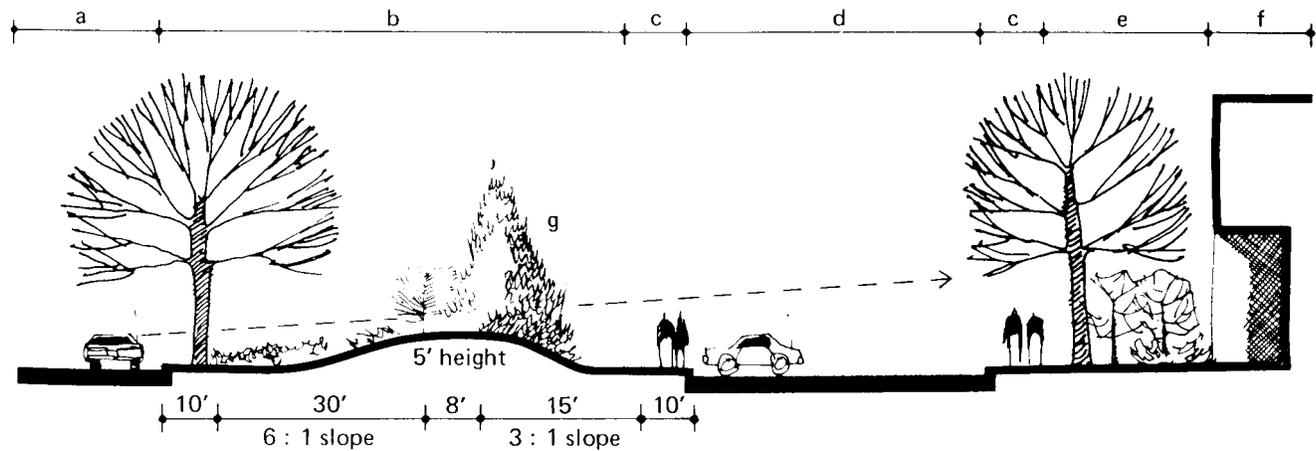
Section through Street Edge: Mounded Buffer and Parking
